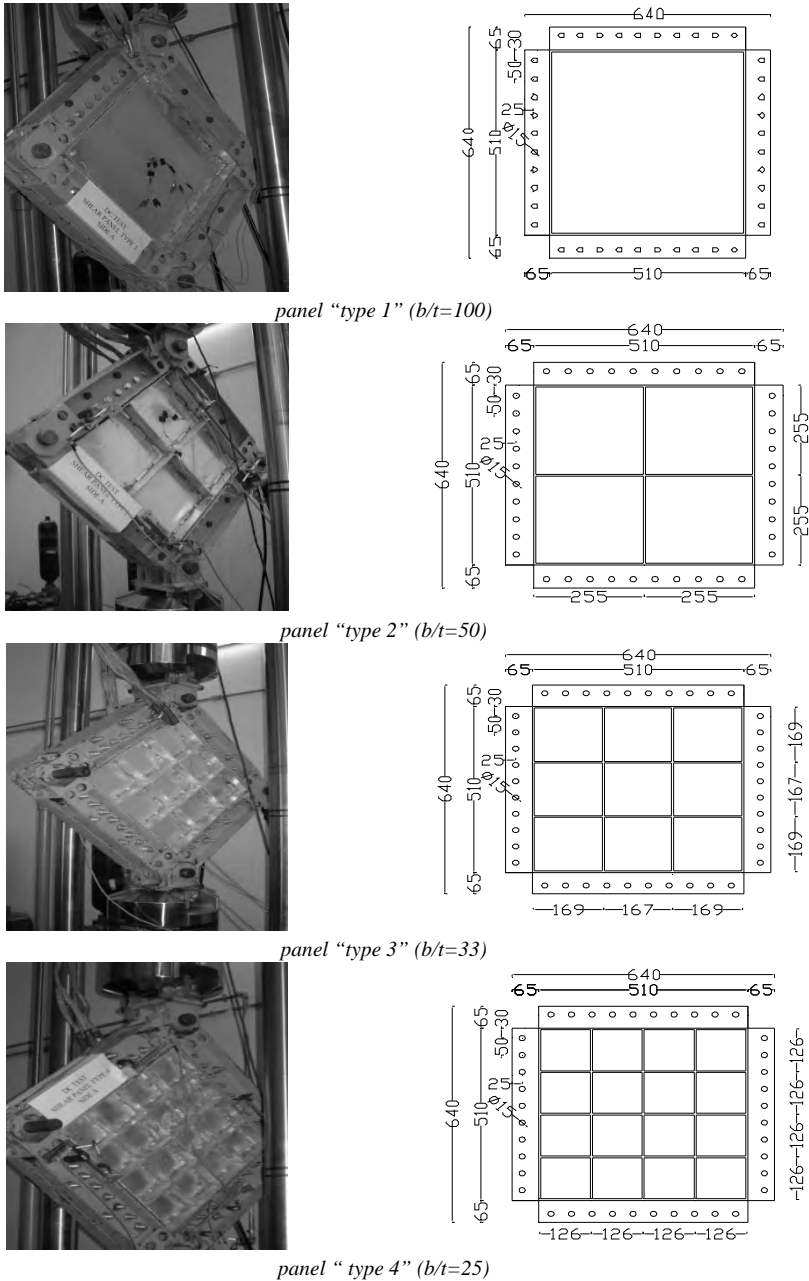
The tested pure aluminium bracing type shear panels configuration.
